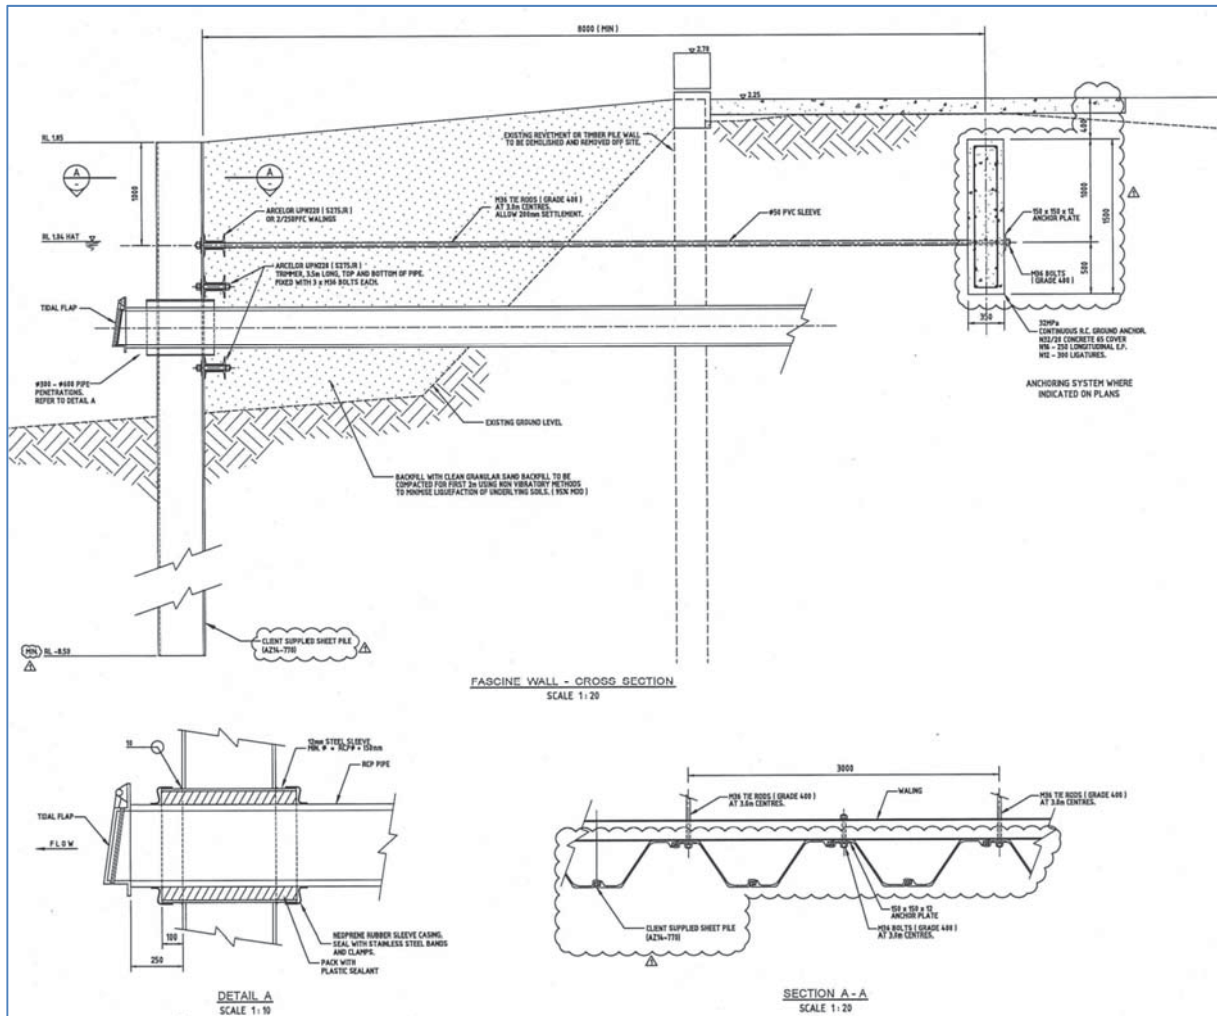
Sheet Pile Design Section (Taken from Cardno Drawing E12002-001-M1 Rev 1)
